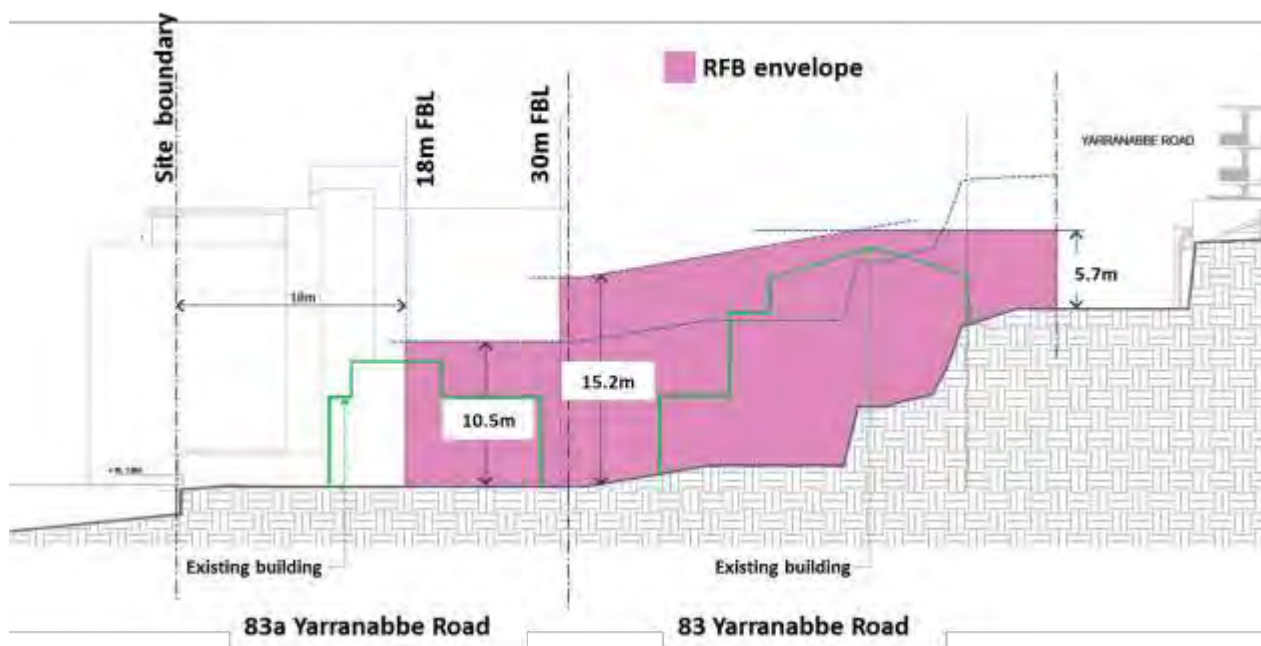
Proposed building envelope for multi dwelling housing or RFB development.
